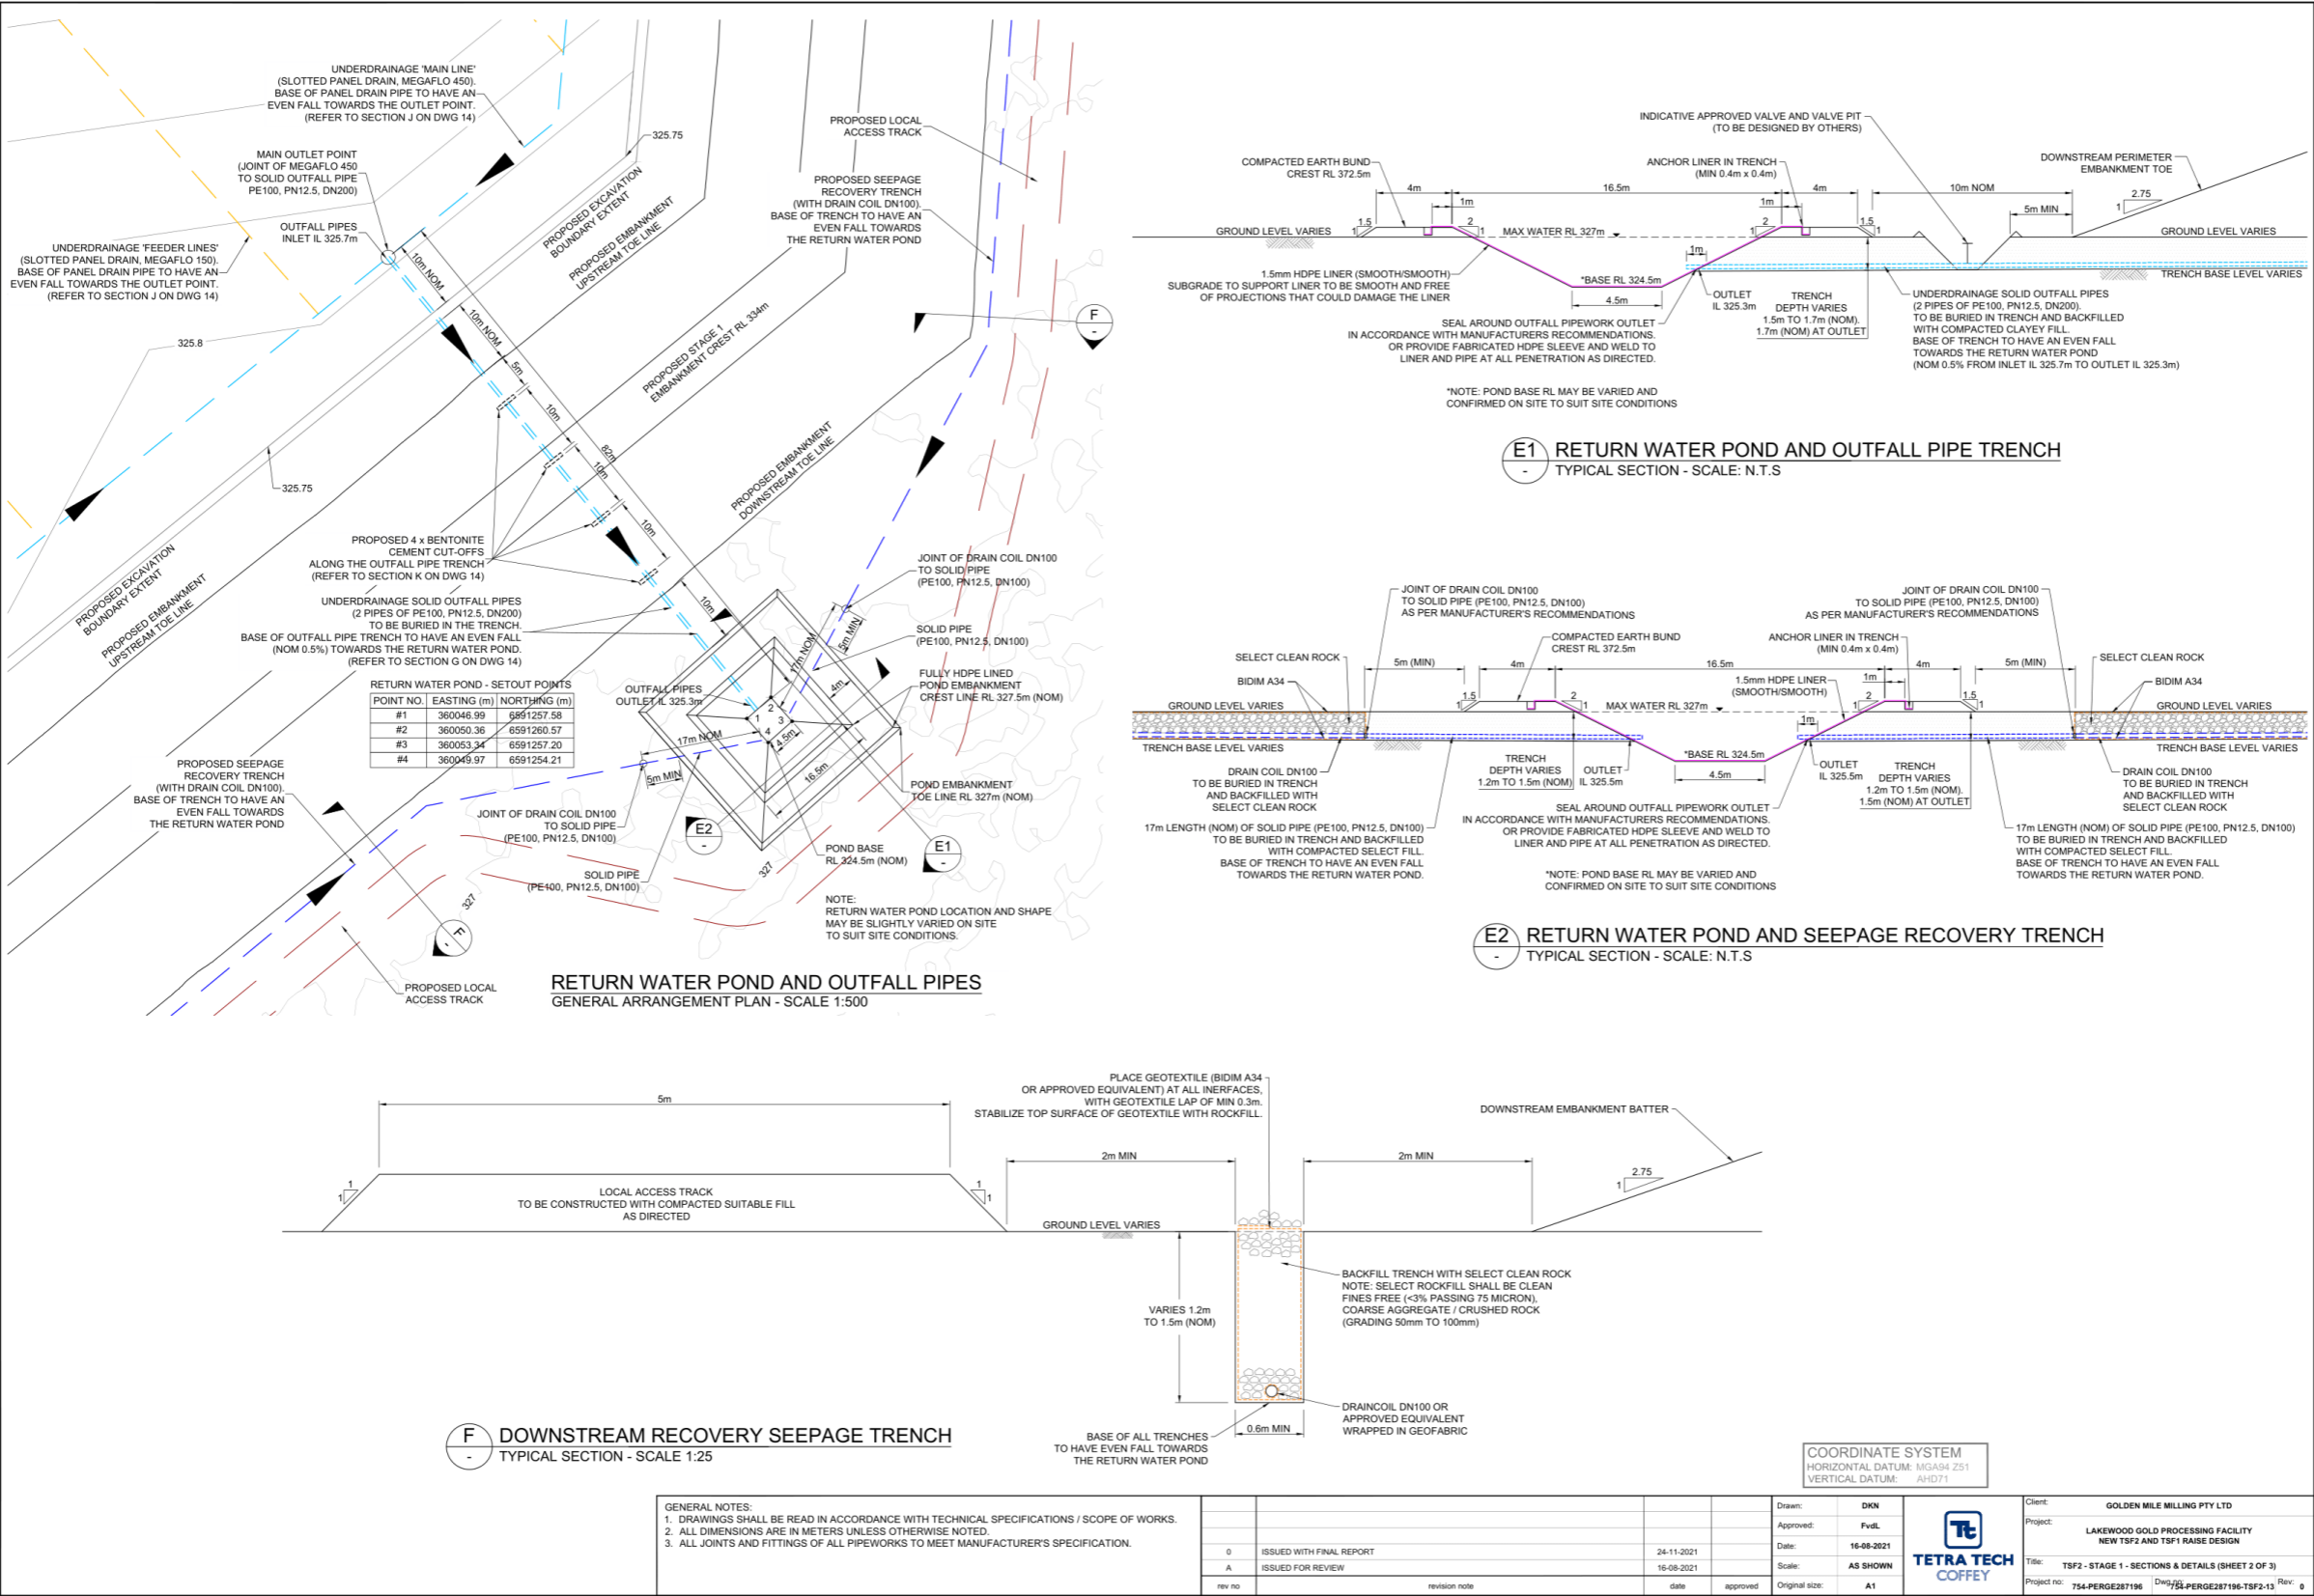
TSF2 – Stage 1 return water pond, outfall pipe and seepage recovery trench construction drawings
